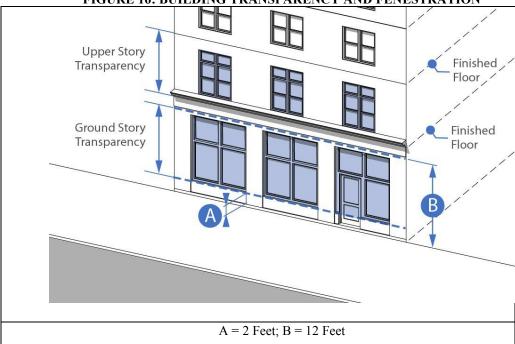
BUILDING TRANSPARENCY AND FENESTRATION
